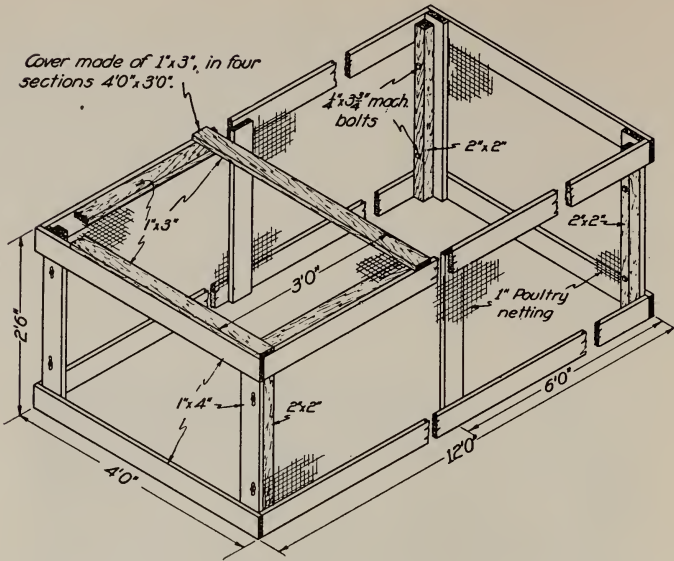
Plan for the construction of the knock-down run to be used in connection with the 8 × 8 foot knock-down poultry house.
